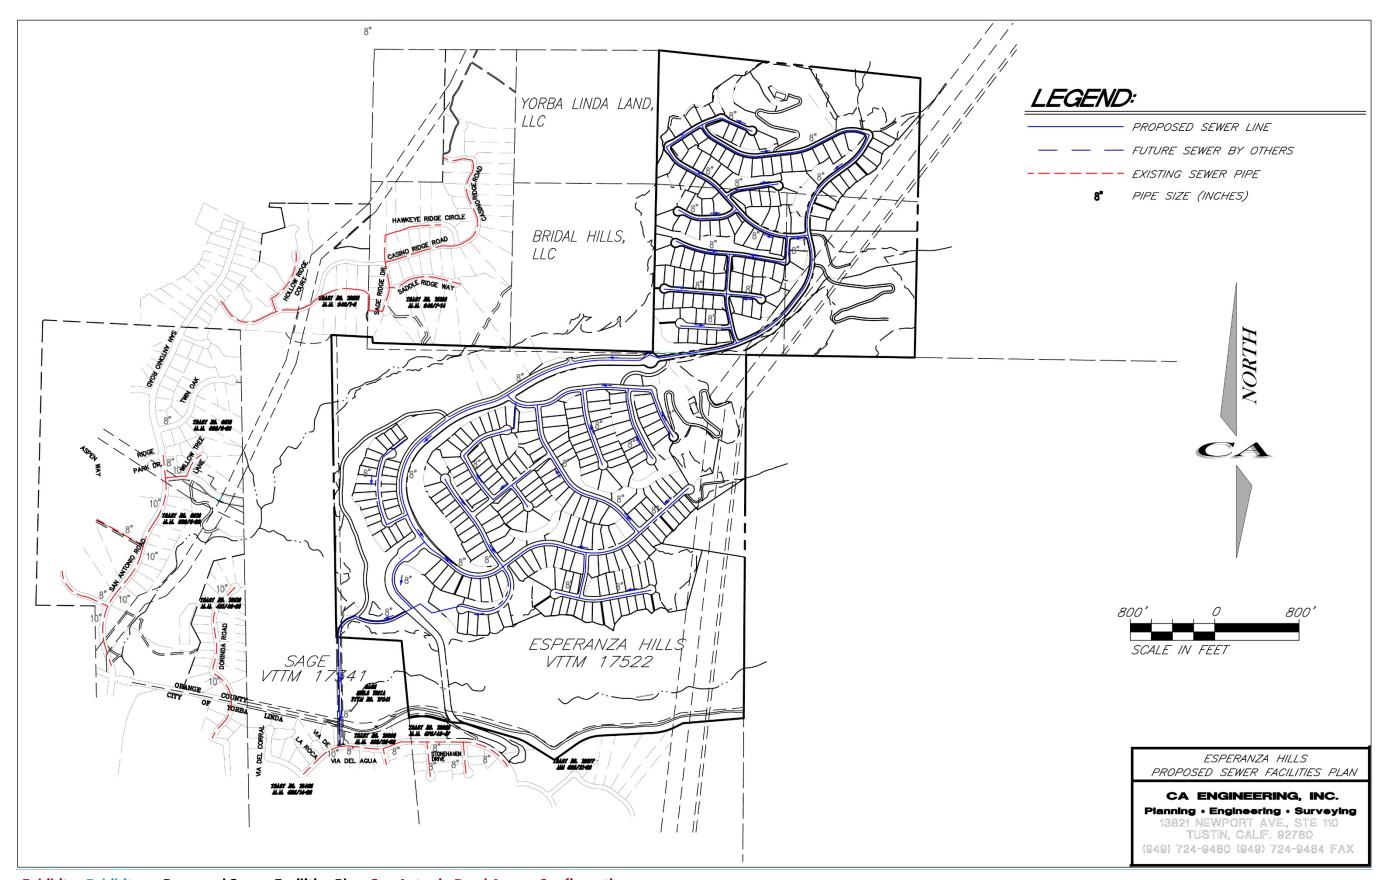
Exhibit 17 – Proposed Sewer Facilities Plan, San Antonio Road Access Configuration
